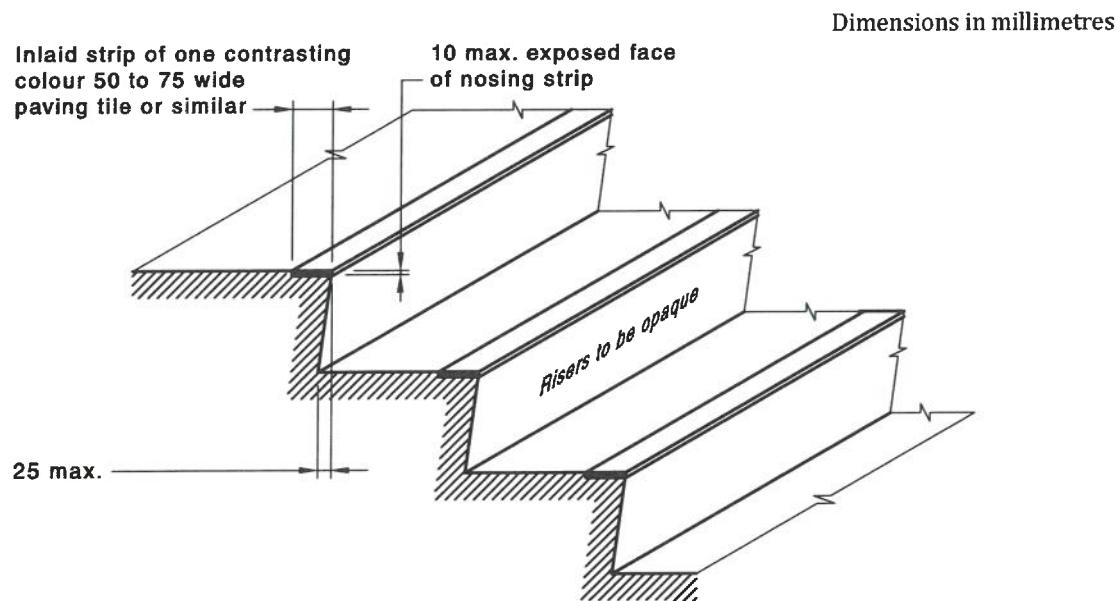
(B) — Typical stair nosing profile with exposed nosing strip
